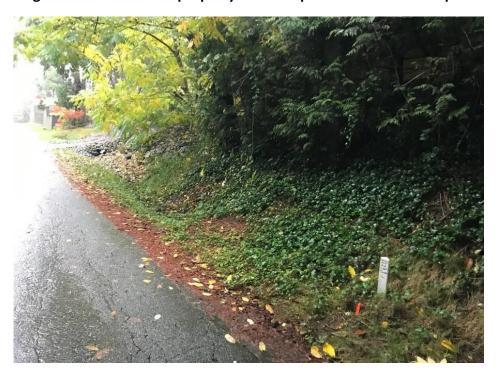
Looking downhill at the subject ditch on Hope St. The proposed 3.7 m open bottom culverts will occur between the two white pins pictured.
